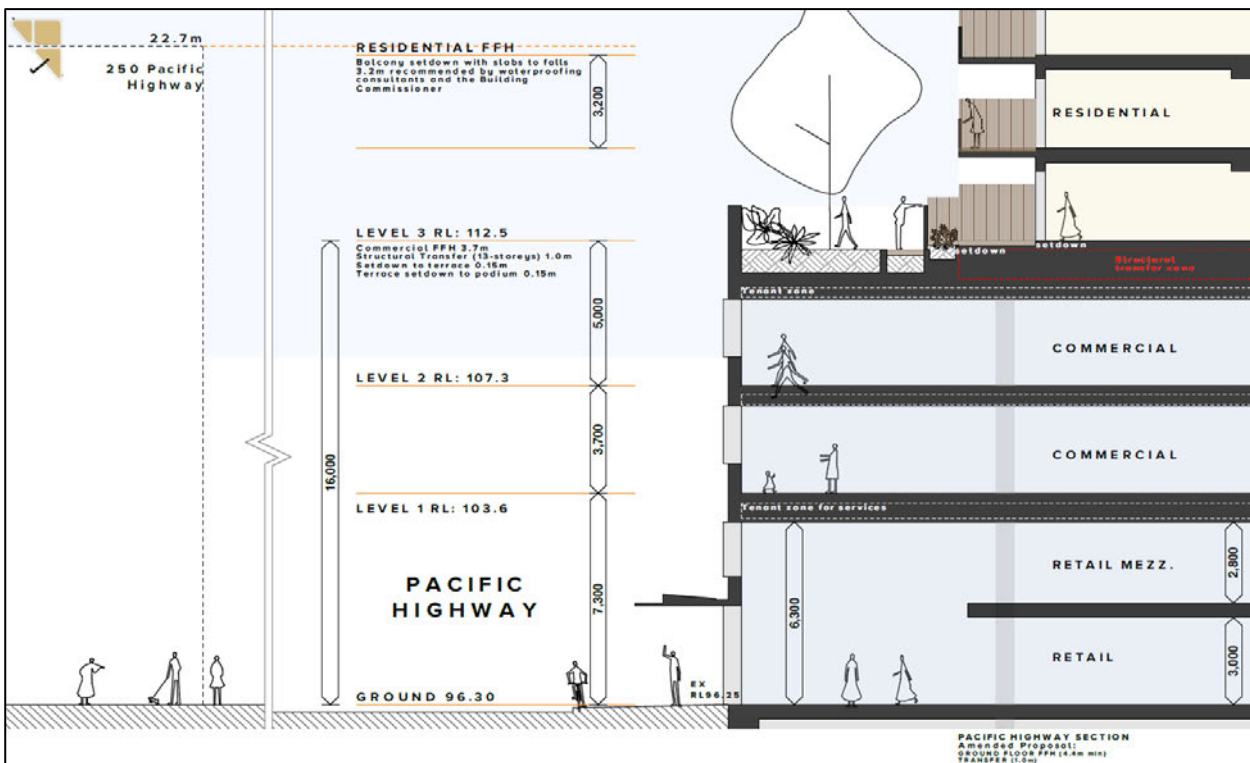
Section of proposed podium development where the street height is higher featuring the fourth storey podium mezzanine (source: Turner)
